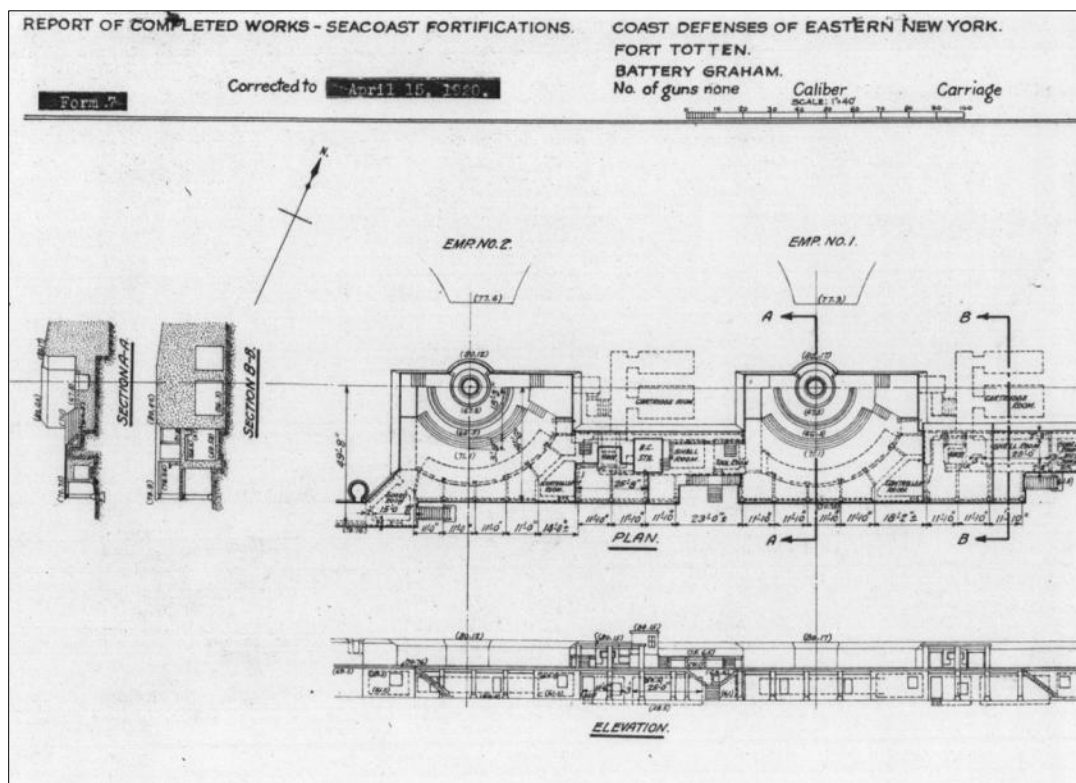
Plan, Elevation and Sections for Battery Graham, Fort Totten, built 1892-1897
